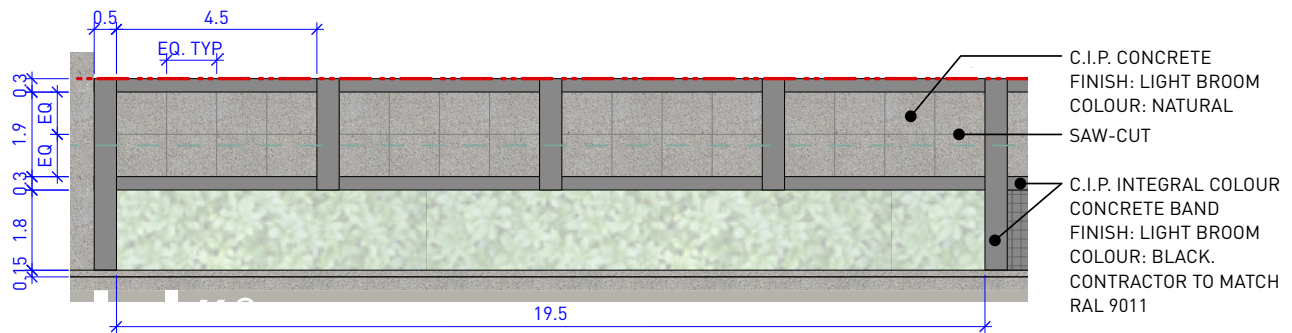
ENLARGEMENT 4 - PAVING AROUND PLANTER
